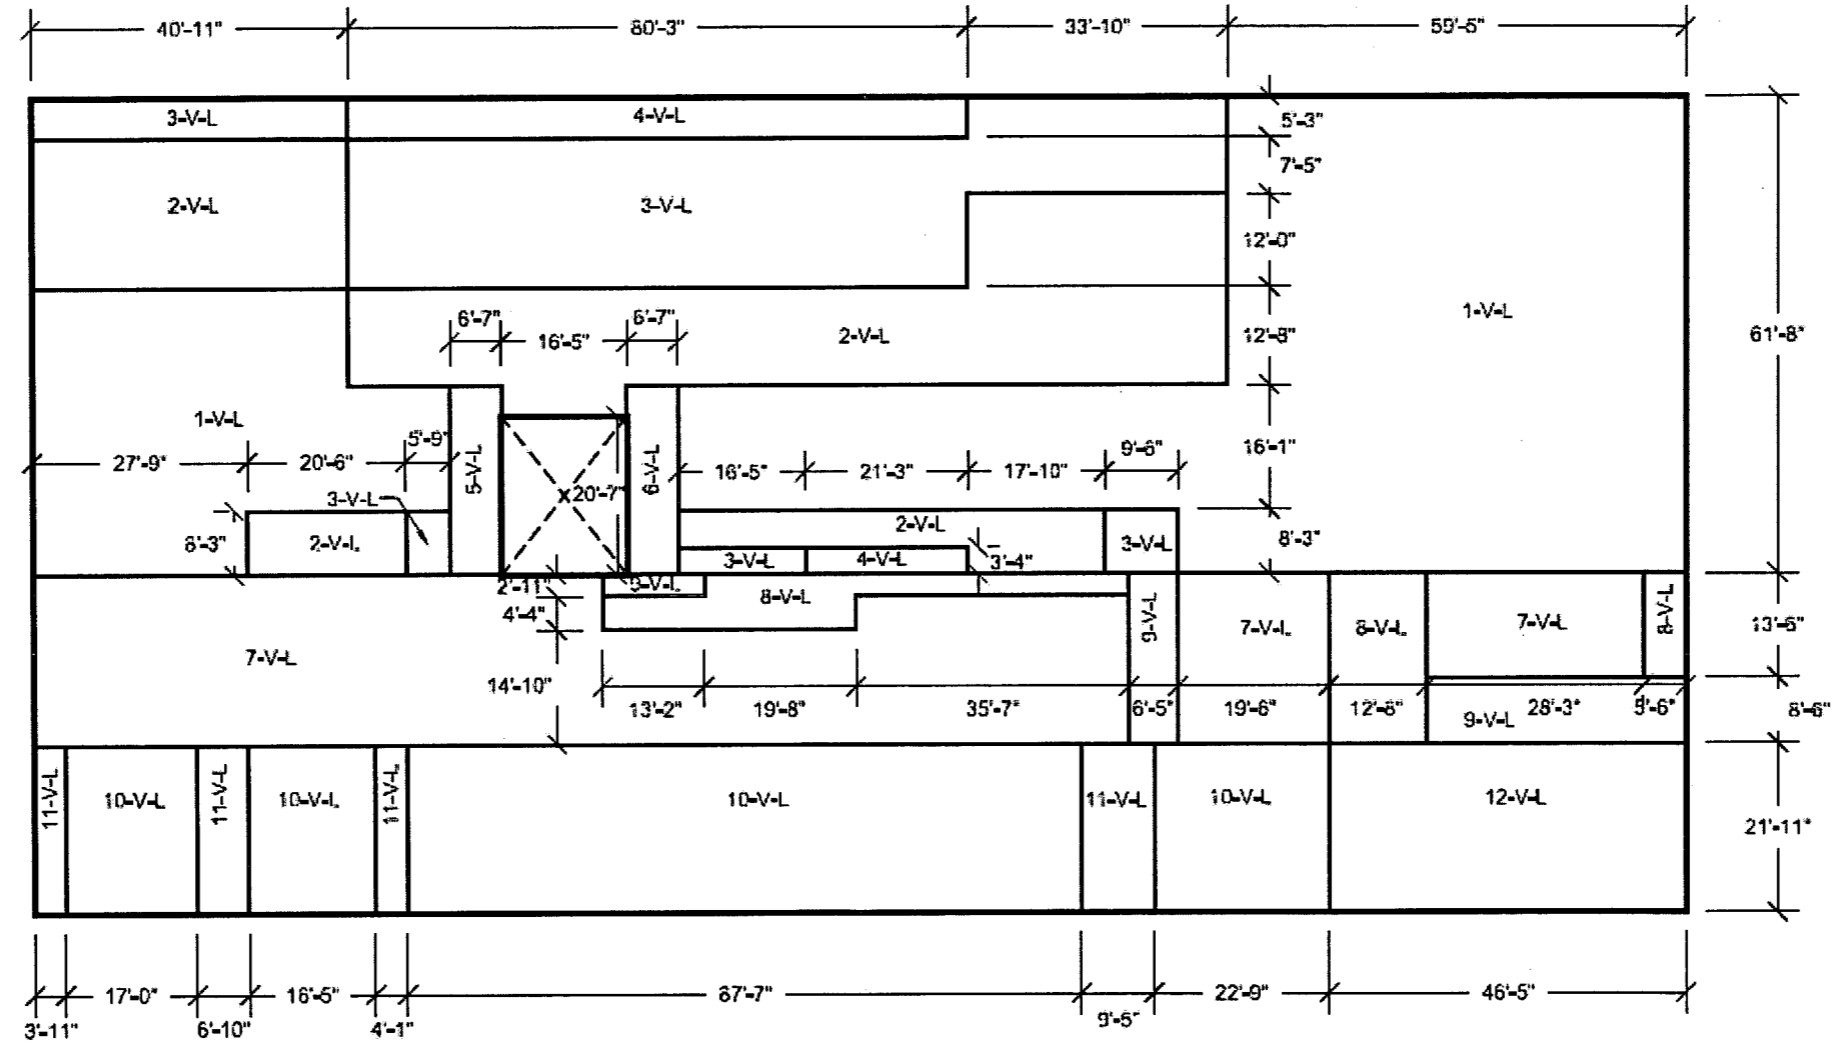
H.3-13: SOUTH WALL LOOKING NORTH
